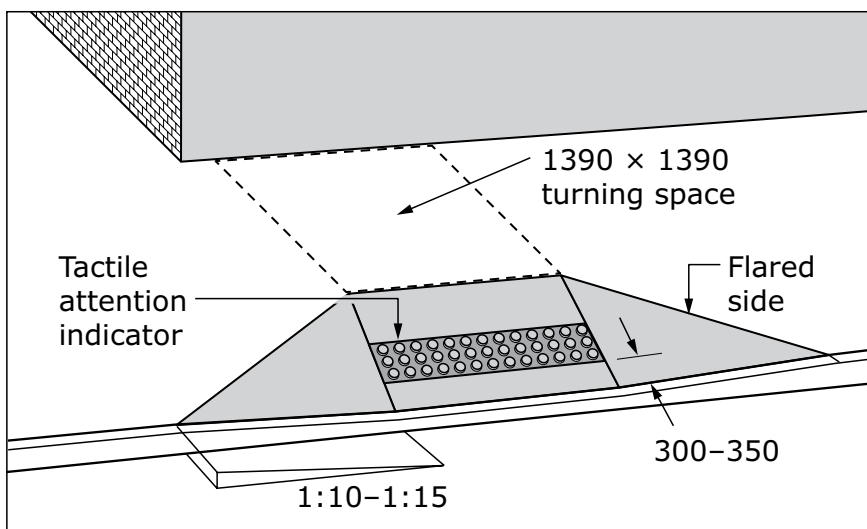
above from CSA B651 – Accessible route and curb ramp with flared sides (See Clauses 8.2.2 and 8.3.3.6.)
